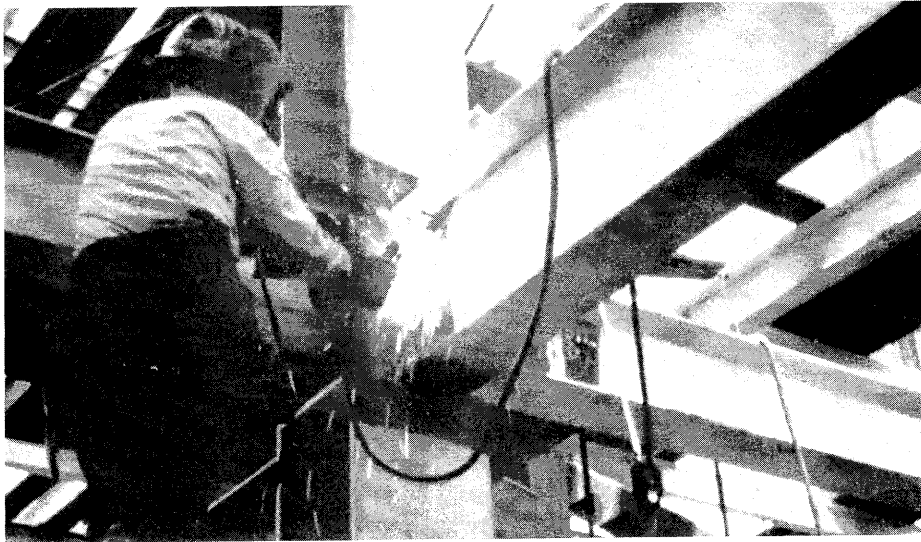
Welded steel construction. (Courtesy of American Institute of Steel Construction)
